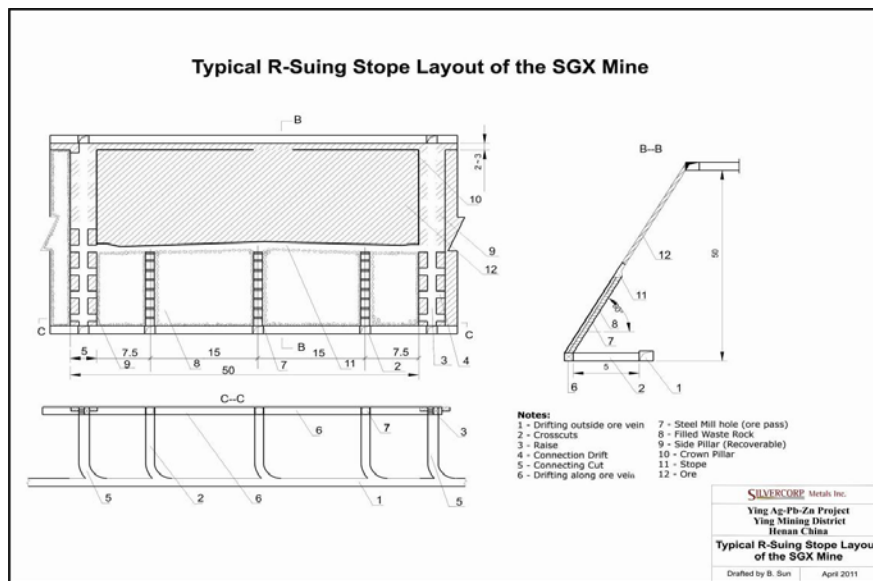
Typical R-Suing Stope Layout of the SGX Mine
